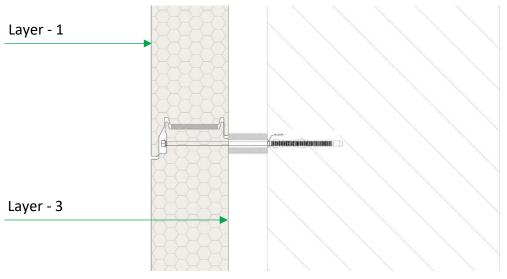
Preliminary sandwich panel design [drawing created using AutoCAD]
